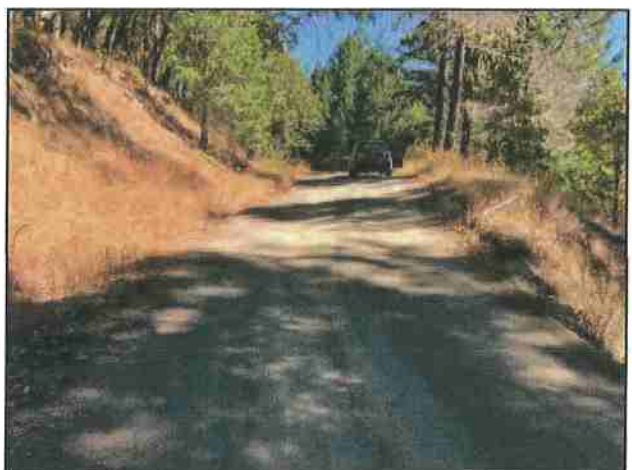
River Rd Looking NE @ Curve w/ Pullout
